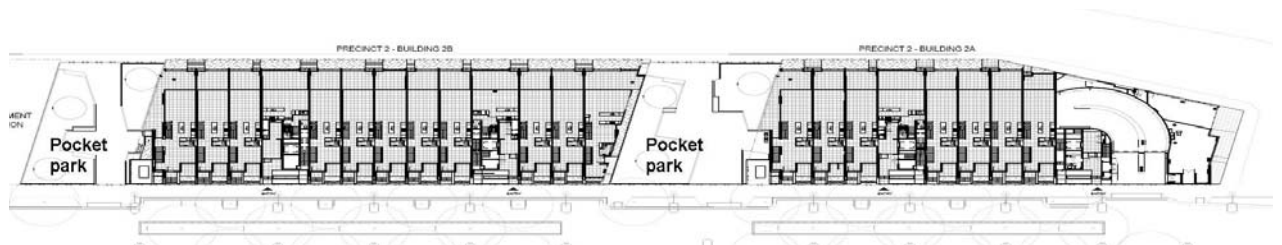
Buildings 2A and 2B and proposed pocket parks / through-site-links.
